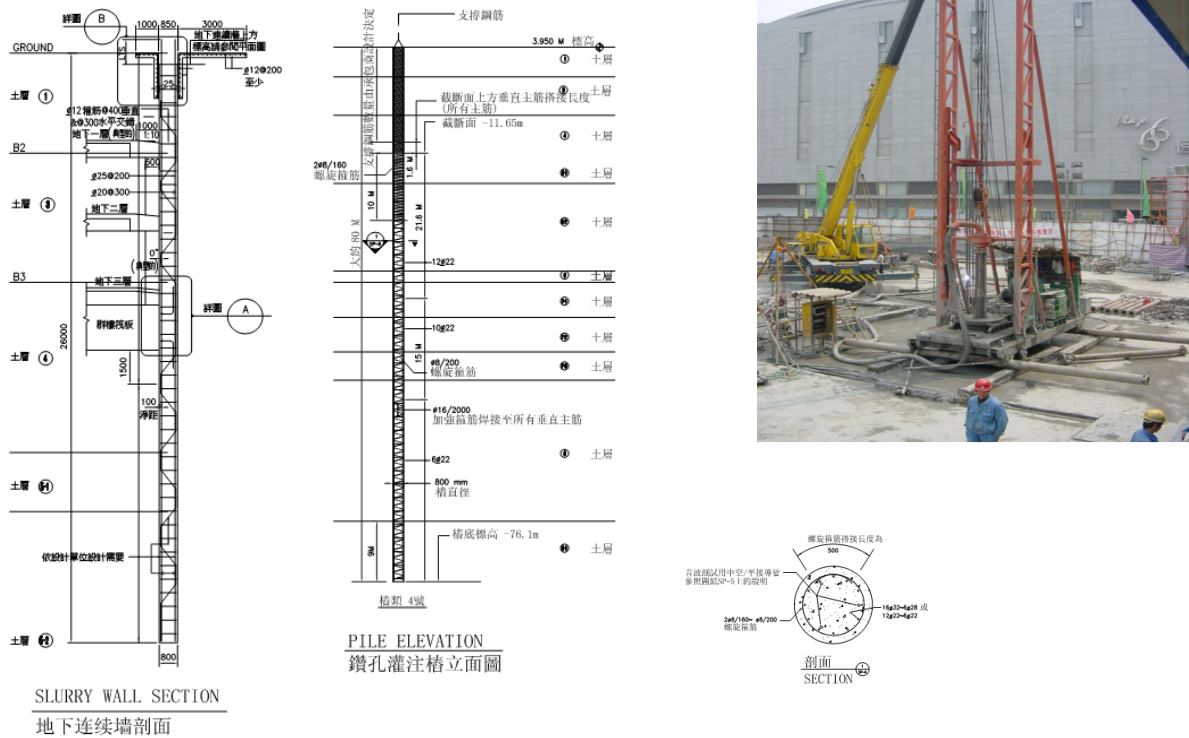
SLURRY WALL SECTION, BORED PILE ELEVATION AND SITE PHOTO
